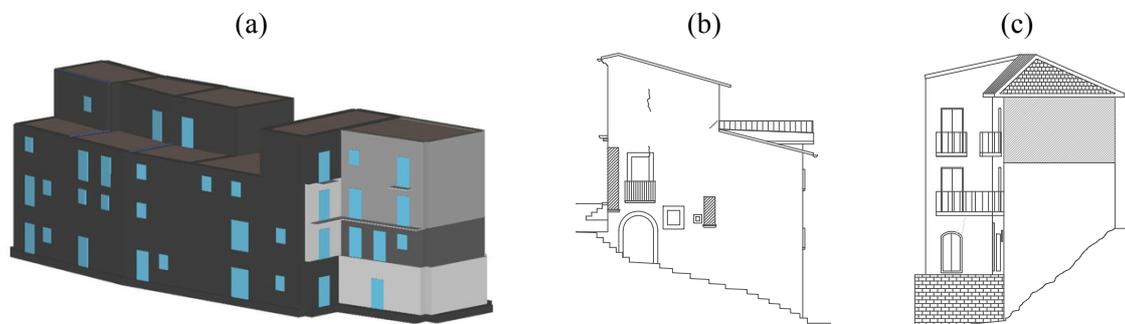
South façade of the building aggregate modelled with 3muri[®] (a), East (b) and West (c) side elevations of the building aggregate
